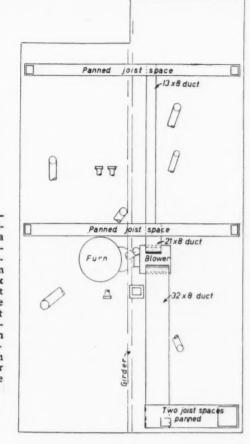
B—The addition of a blower permits drawing return air from six rooms, yet less usable b a sement space is required than for the original 26-inch return air pipe. (See Fig. 3-A)
